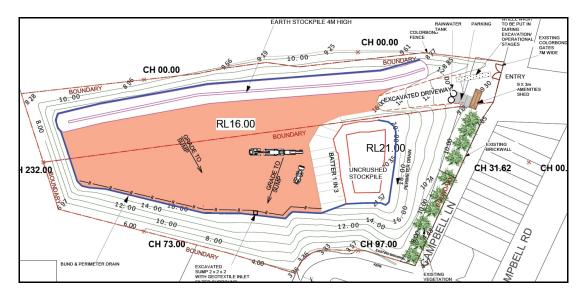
Extract from the plan of Stage 2B. Full details are provided on Drawing No.16, Issue E of the plans of the proposed development at Appendix 9.
